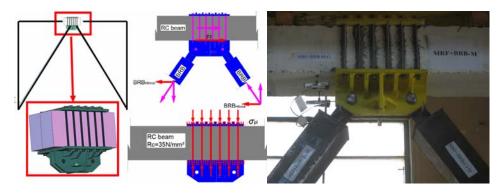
Beam – brace connection: pressure under the steel plate due to bolts pre-stressing
